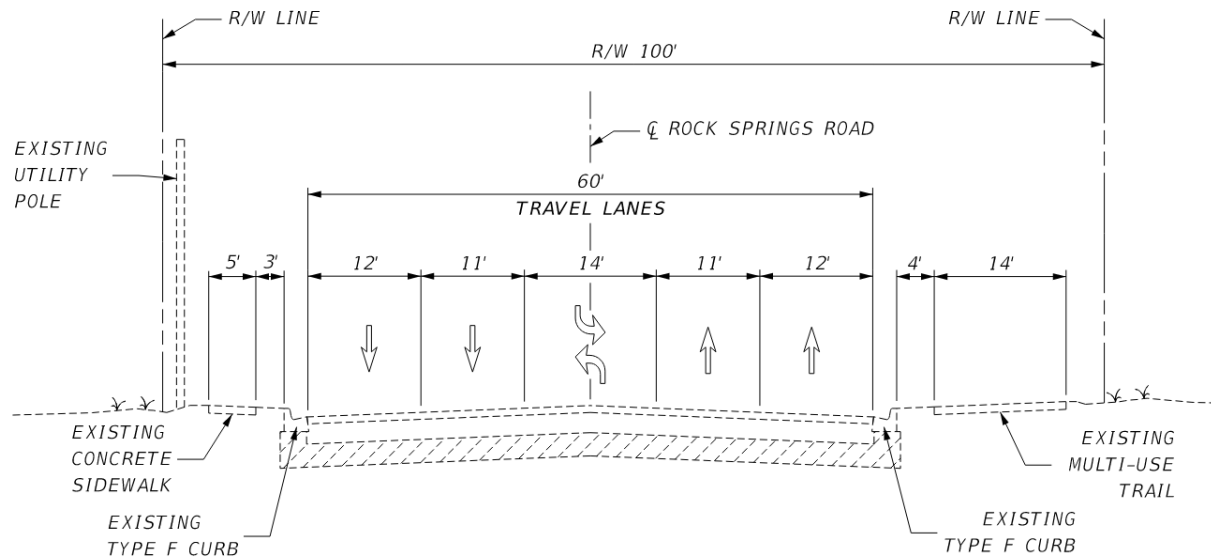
| Existing Typical Section – Rock Springs Road from Welch Road to 360 feet north of Welch Road
